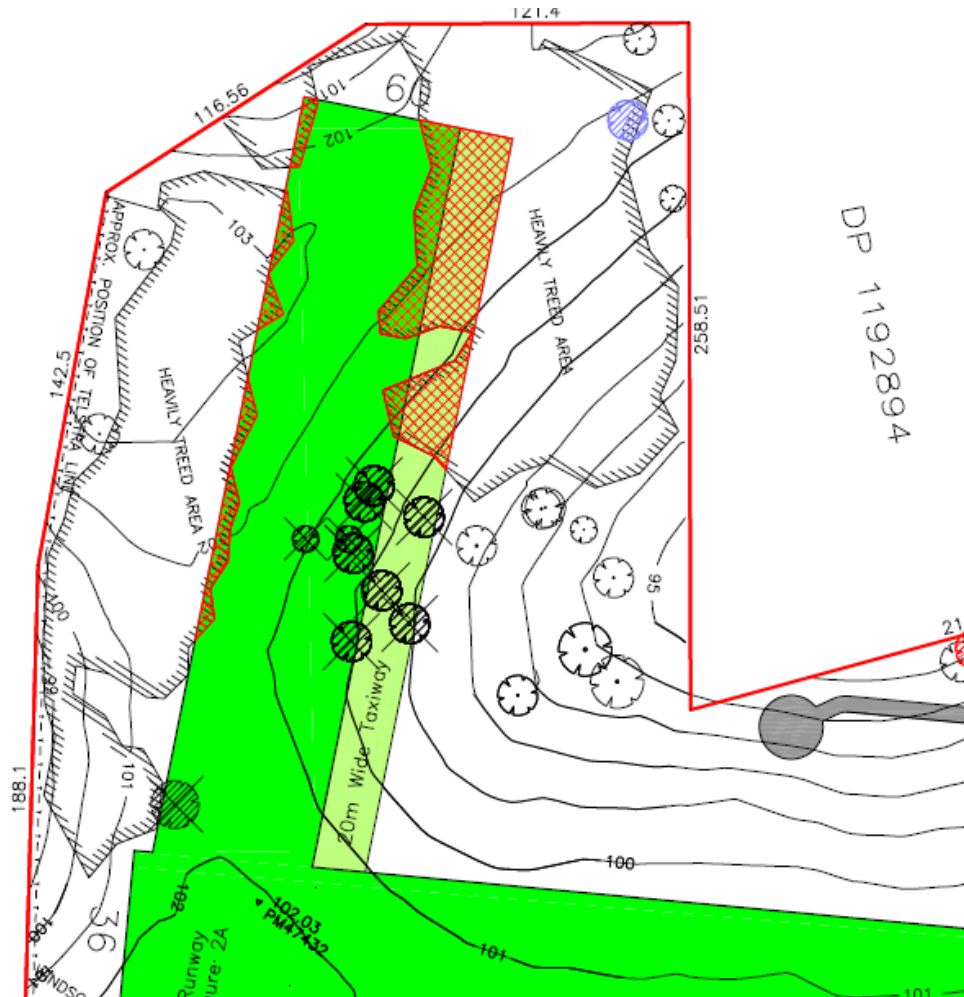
Excerpt from plan set detailing proposed vegetation clearing adjacent to east-west runway (runway 27)
